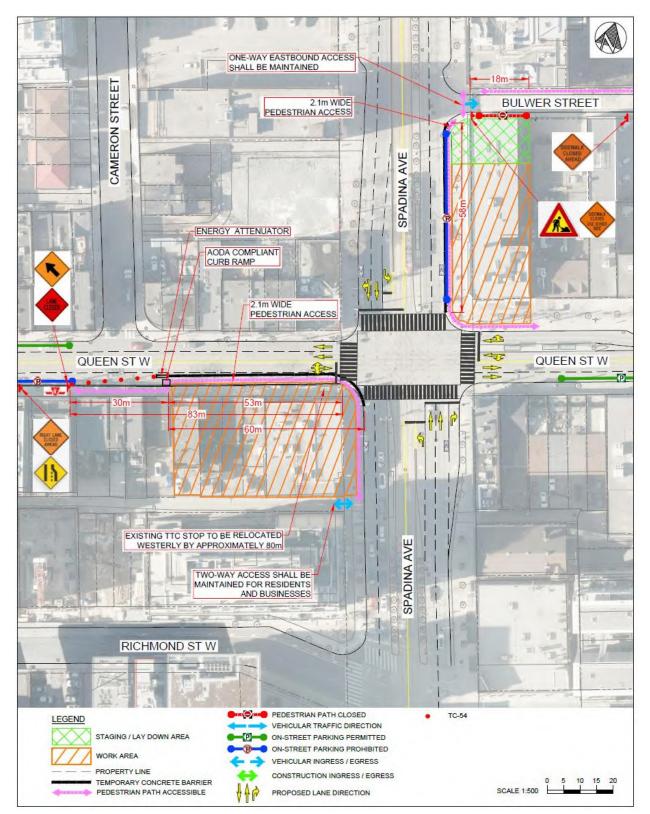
Queen-Spadina Station Traffic Staging Plan
